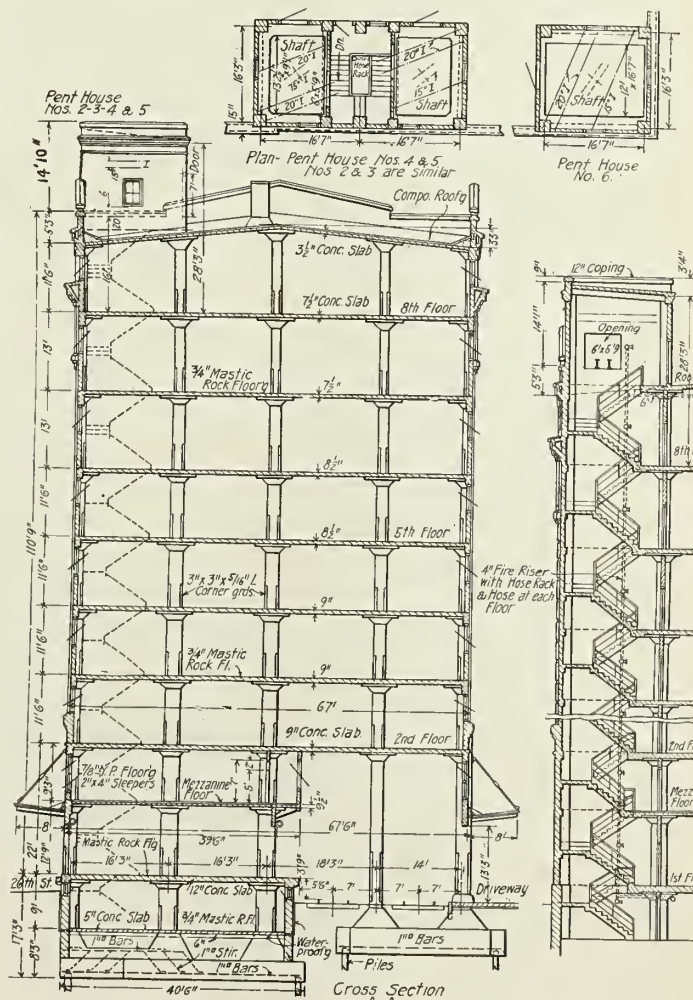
Cross Section of B. & O. R. R. Terminal Warehouse in New York.
